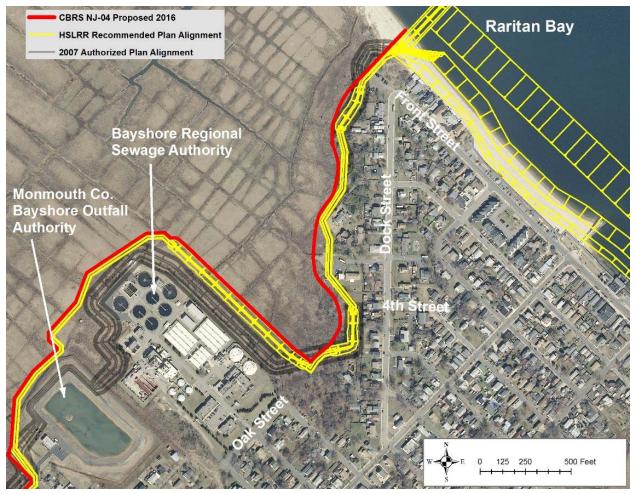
HSLRR Recommended Plan Chingarora Creek Element (3 of 3)
